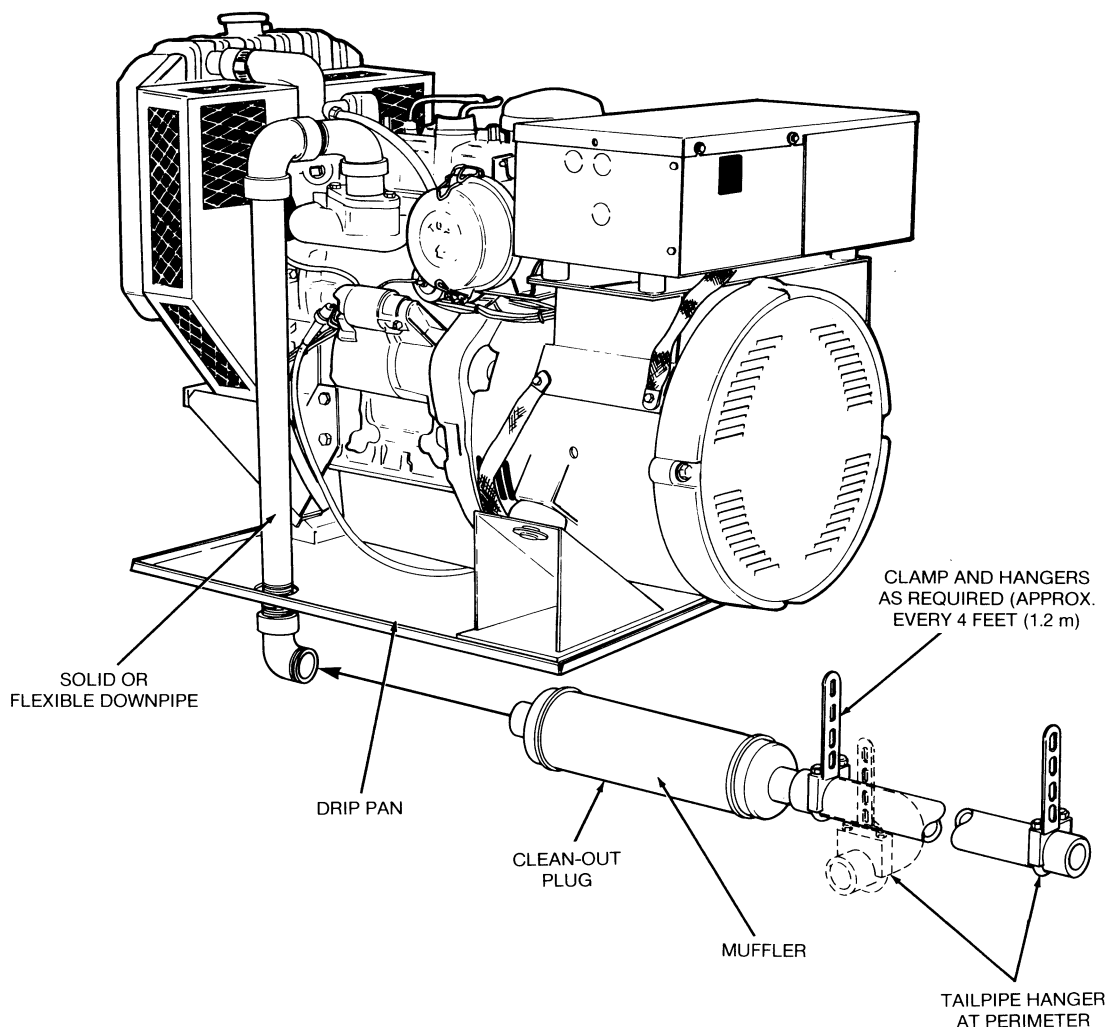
TYPICAL EXHAUST INSTALLATION
